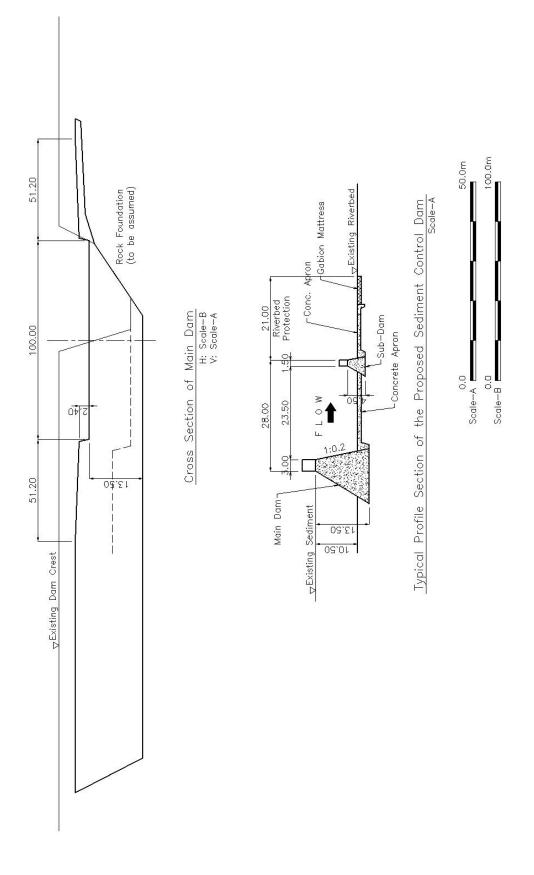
Typical Section of Proposed Sediment Control Dam
